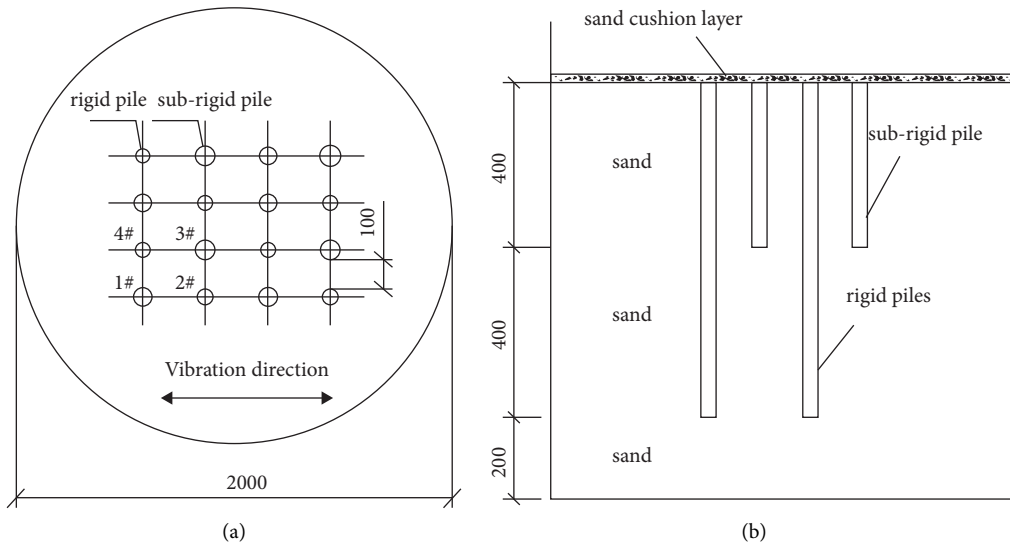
Layout of test piles: (a) plan view and (b) sectional view.
